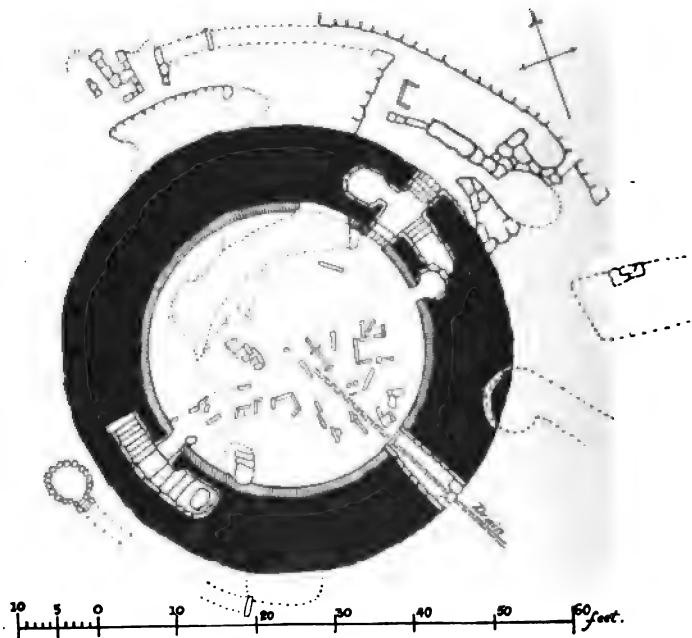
Ground Plan of Keiss Broch and its outbuildings.
